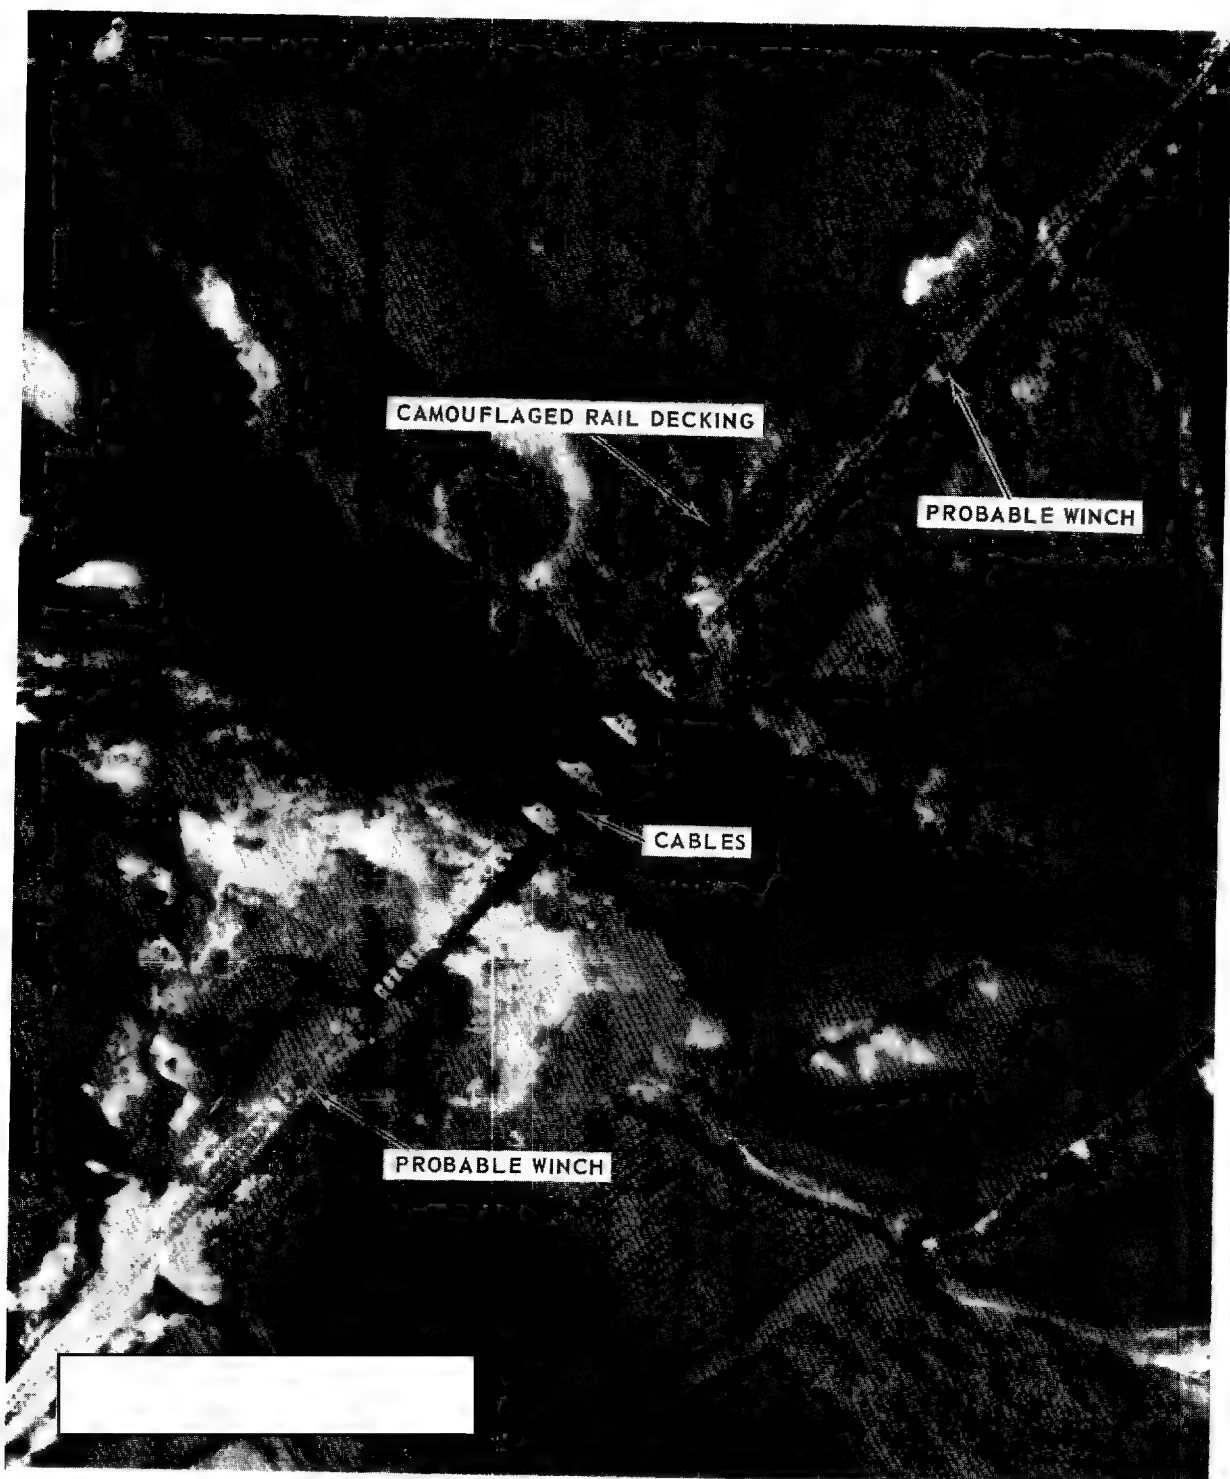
RAILROAD CABLE BRIDGE, VINH/DONG HOI RAIL LINE, NORTH VIETNAM
